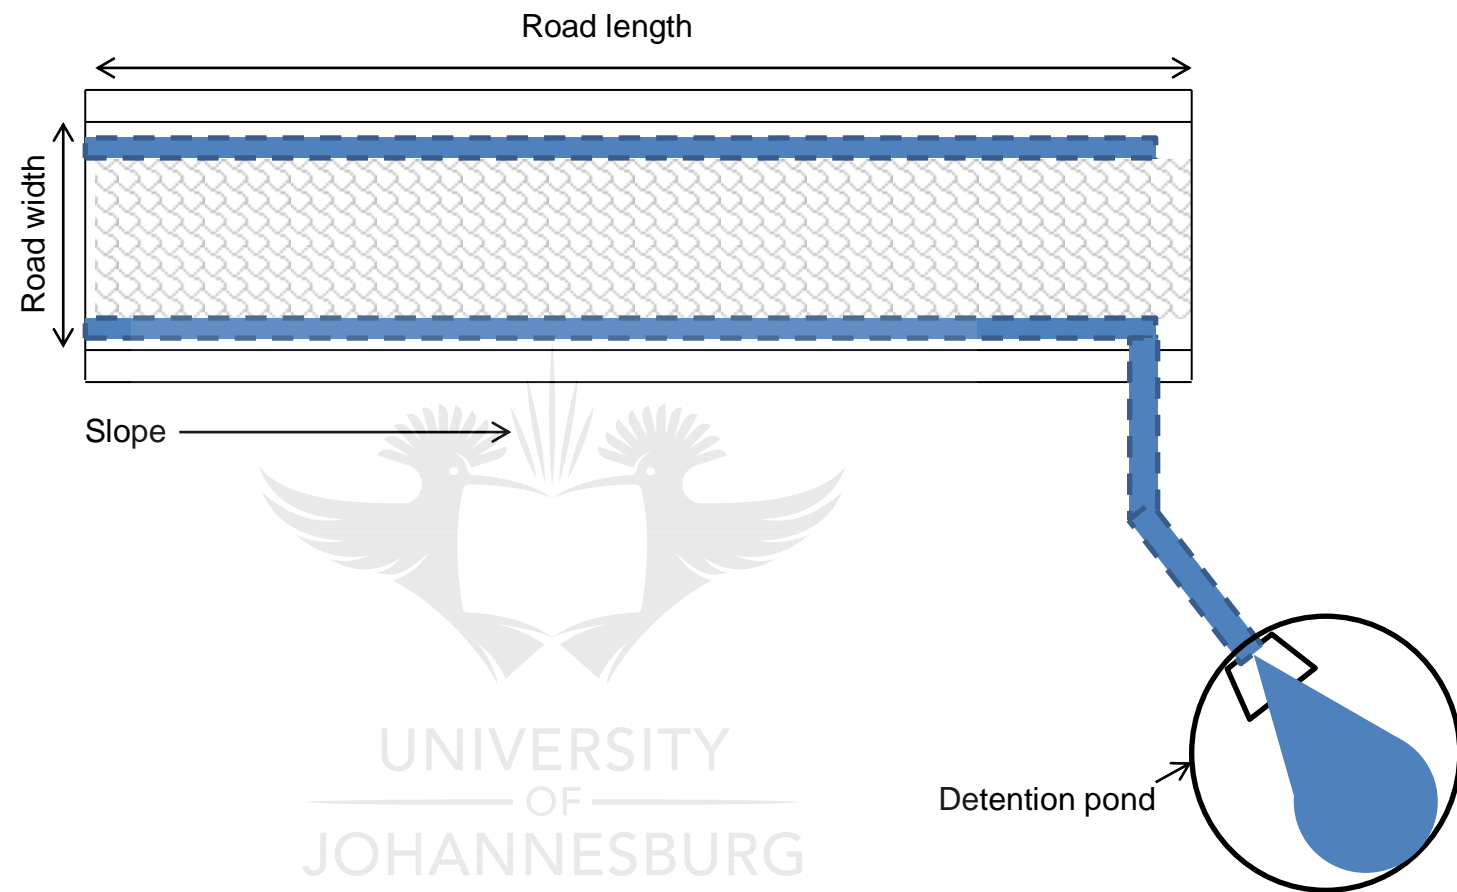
Typical layout plan for pervious interlocking paving blocks pavement
